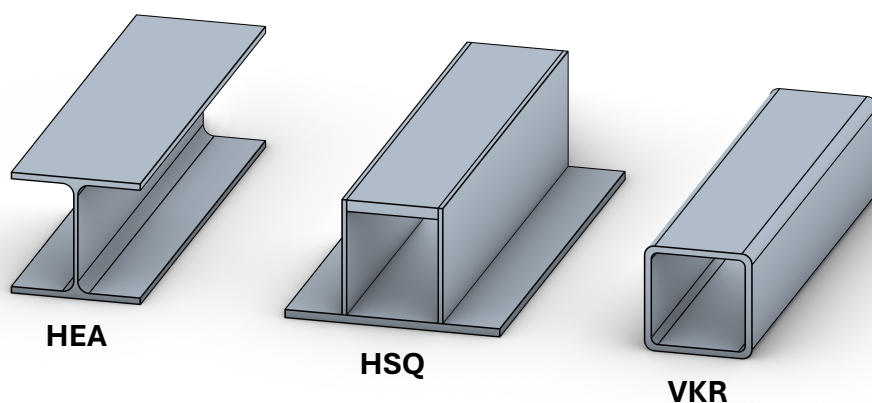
Common steel profiles used as structural members in building construction in Sweden.
